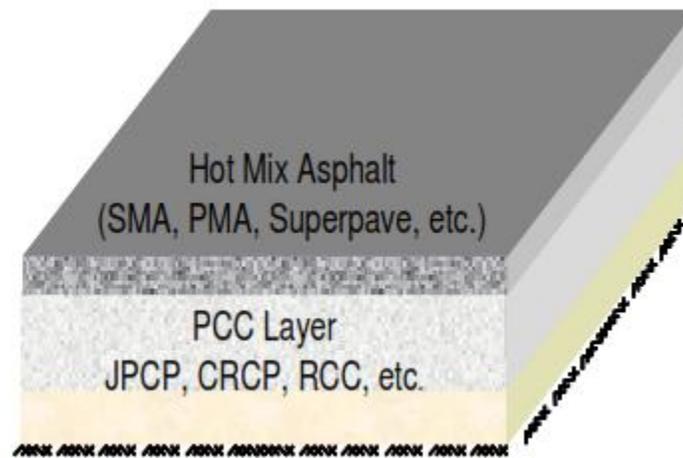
Typical cross section of an AC overlay over a PCC pavement (from Rao et al. 2011)
